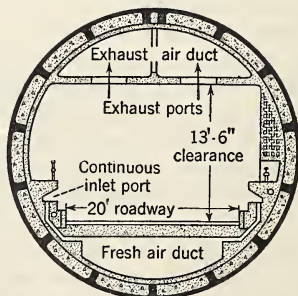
Cross-sectional view of one of the tunnels under the Hudson River. The diagram shows how tunnel is constructed.
